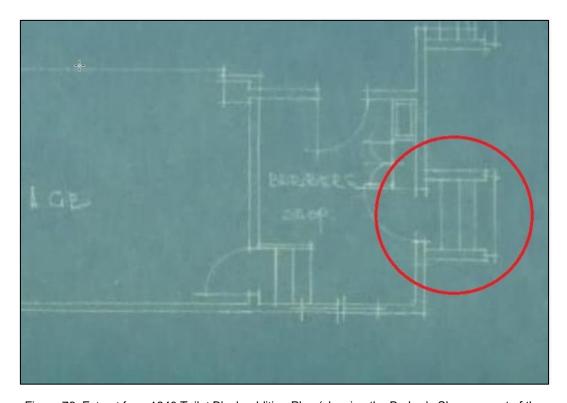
Extract from 1940 Toilet Block addition Plan (showing the Barber's Shop, as part of the original building) – Door and steps circled in red removed –see outline above in figure 75.
